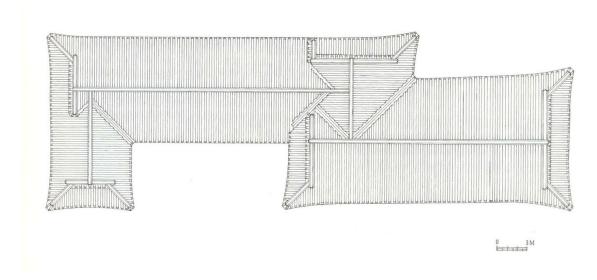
Anchae, Sarangchae Roof Plan (N. Zu 2003)
